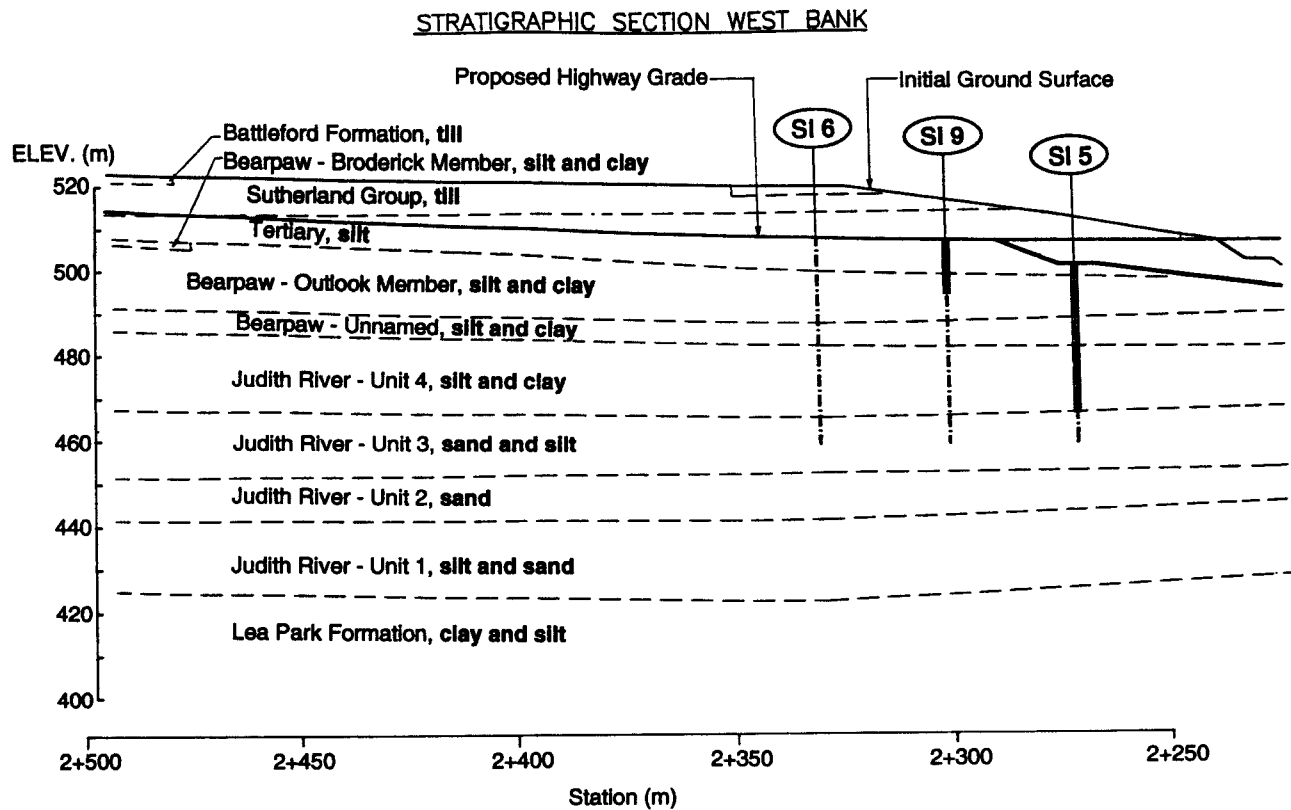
Cross-section of west bank, Outlook Bridge site, Saskatchewan, Canada.
